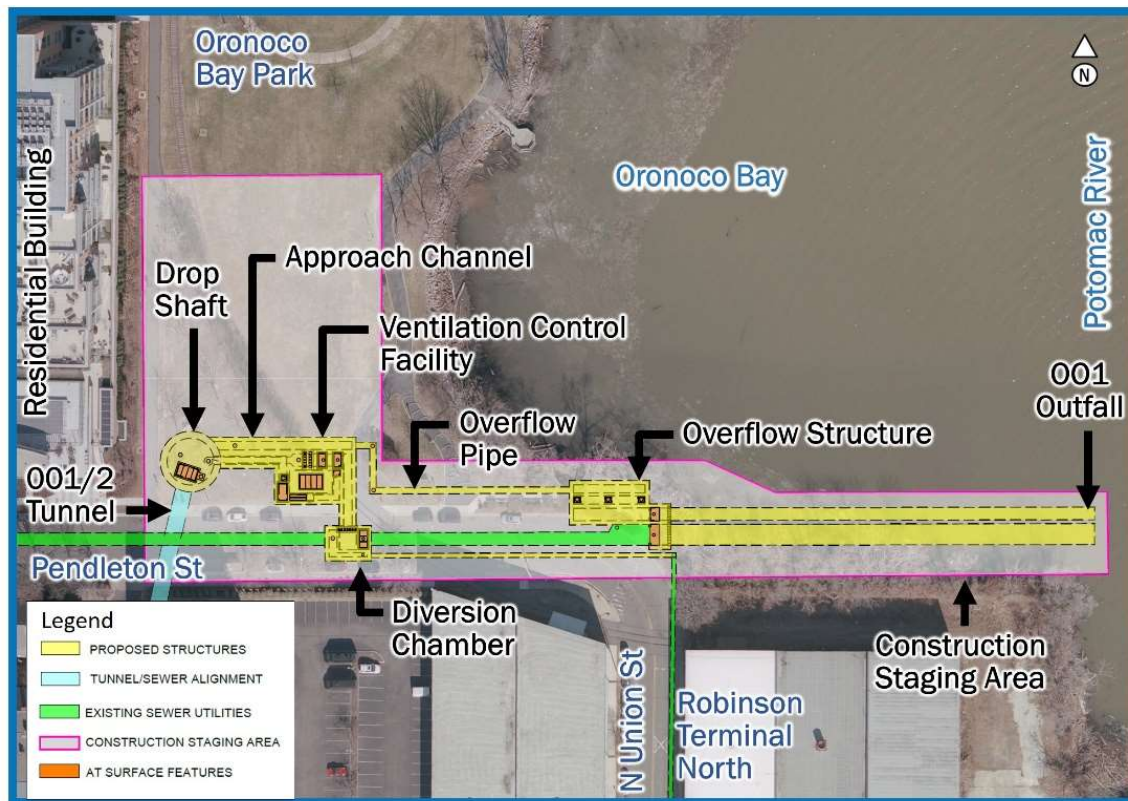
Oronoco Bay Park West Diversion Facility (pairs with Lee Street Alignment)
